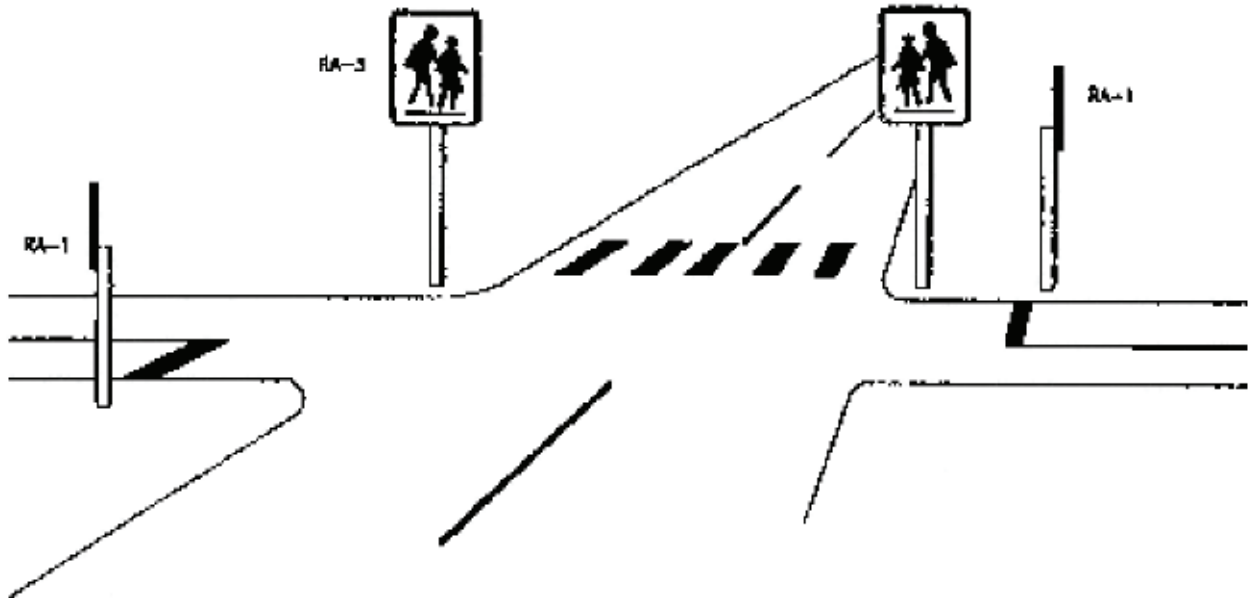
School Crosswalk with Zebra Pavement Markings and Advanced Warning Sign
